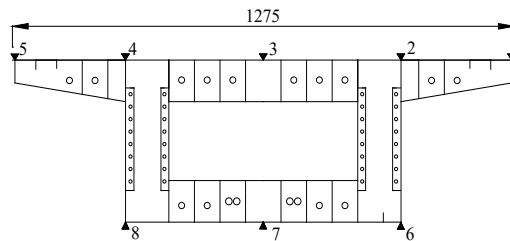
Layout of control points on the steel-concrete composite segment (unit: cm)
